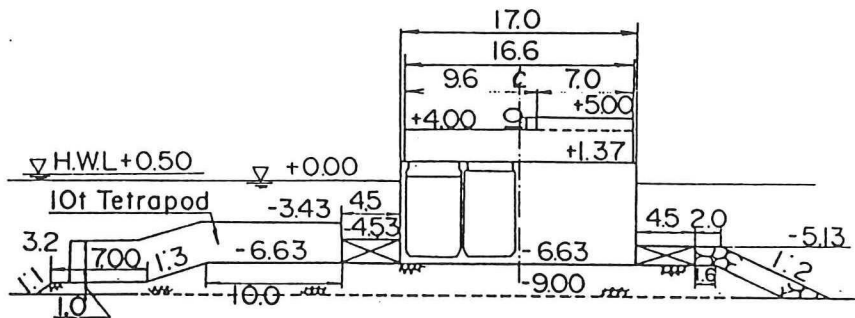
Cross-section of caisson breakwater before damage at Sakata Port.
